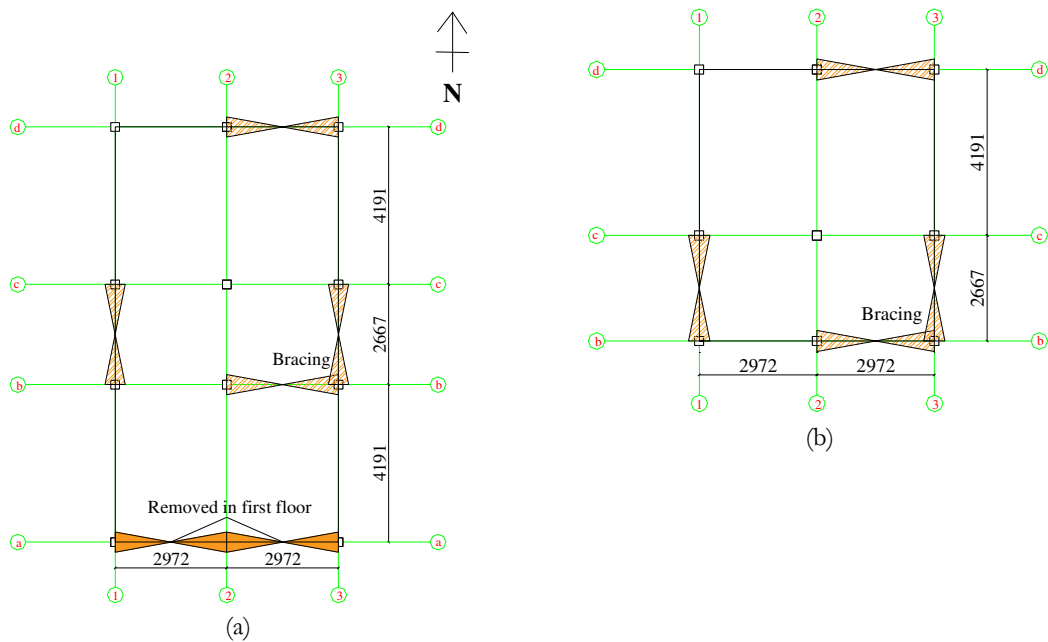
Cross steel bracing layout in the CCP2 building; (a) Ground, first and second floors plan, (b) Top floor plan (all dimensions are in mm)
